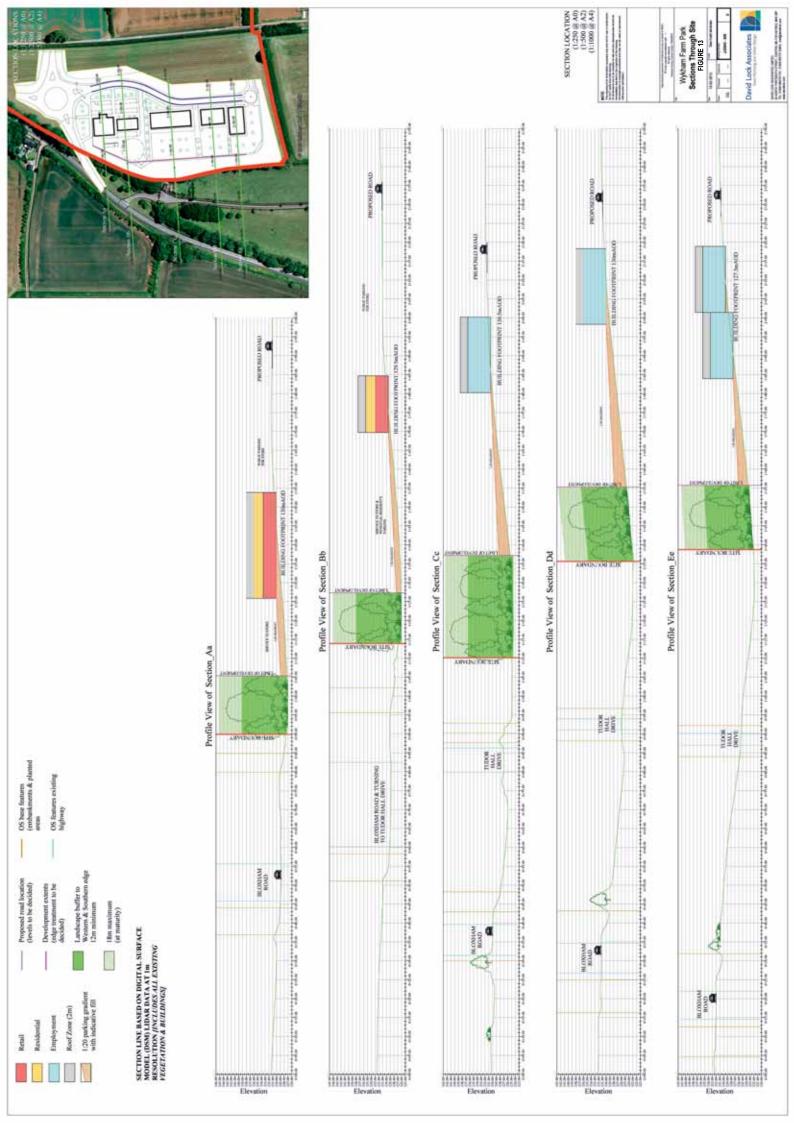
STREET SECTIONS WYKHAM PARK FARM
